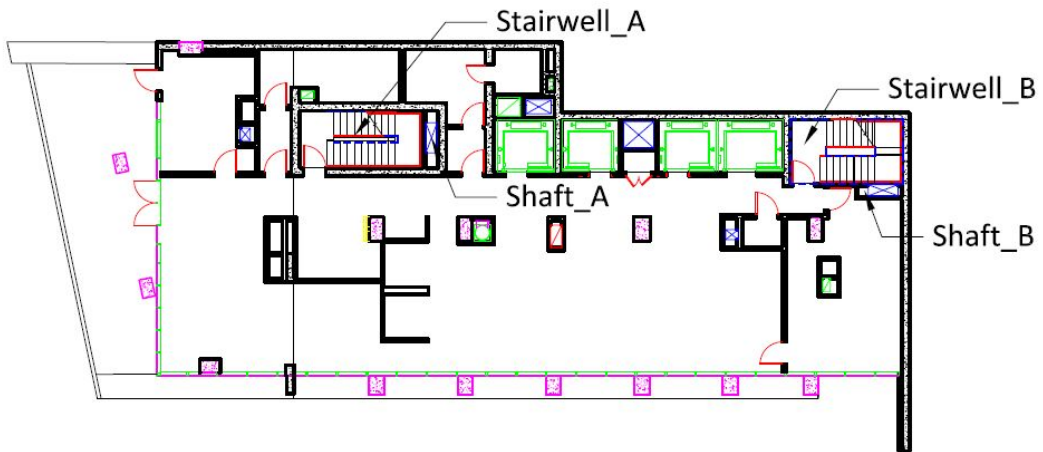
6th floor has an open floor layout for hotel kitchen and dining area
